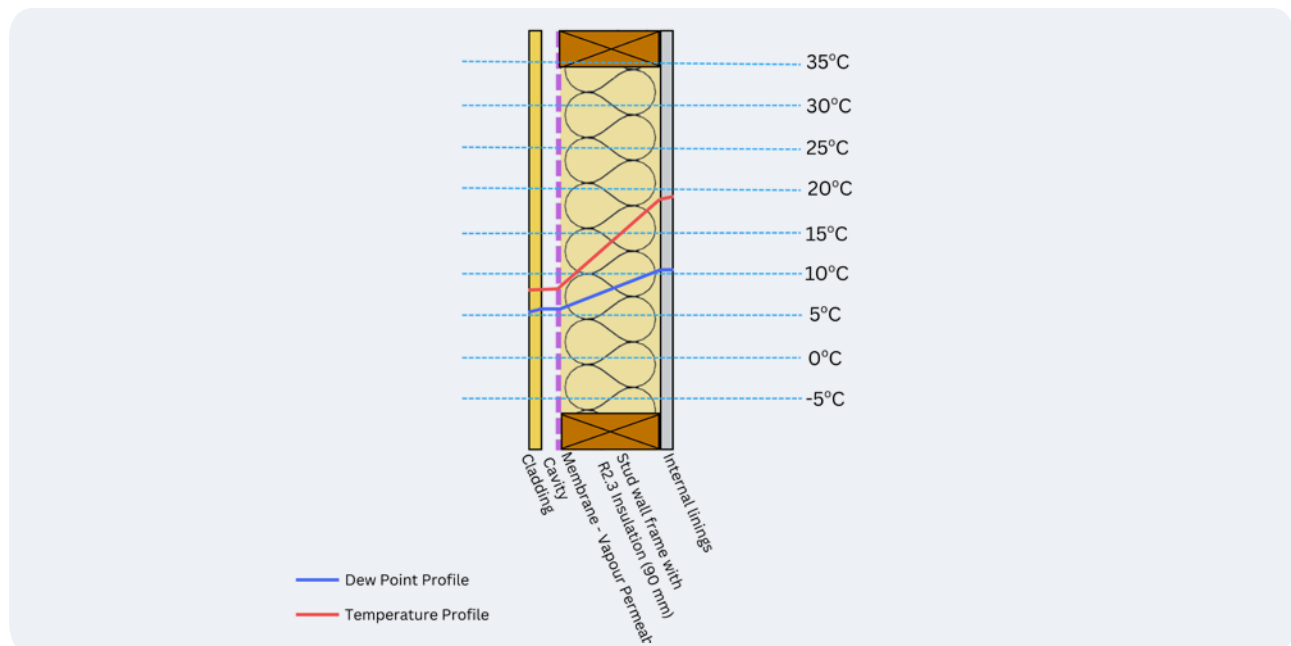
Lightweight timber-framed wall with a cavity (Image credit: TDA)
